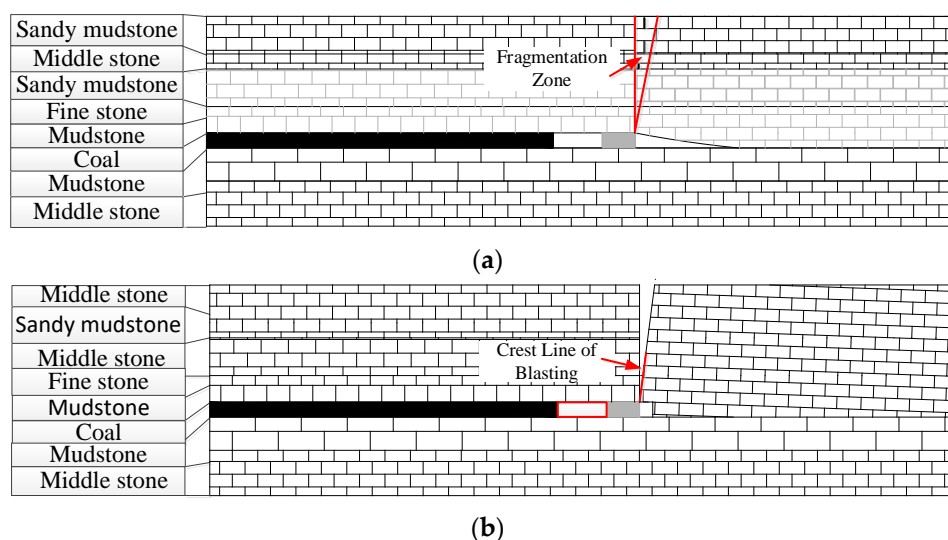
The behaviors of overlying roof strata with and without shallow-hole blasting. (a) Roadway retained surrounding rock structure when roof is not cut; (b) roadway retained surrounding rock structure after roof cutting.
